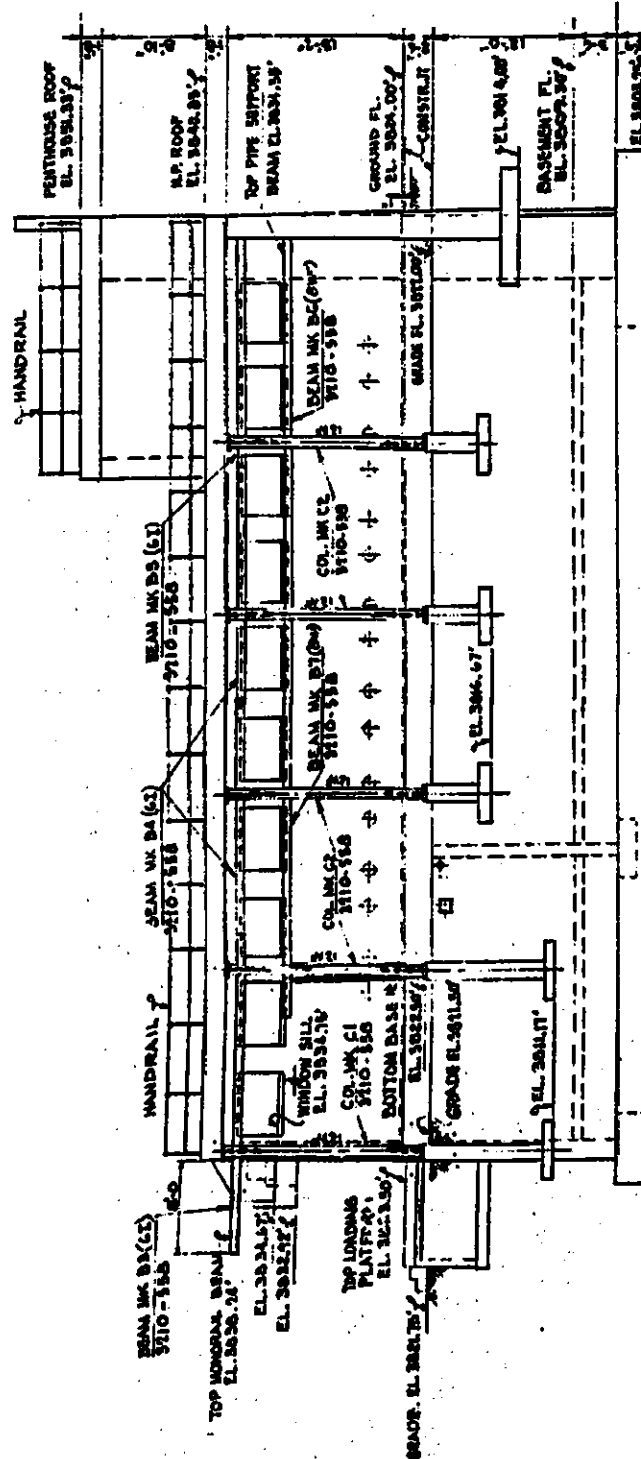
Test Cell C, Building 3210, east elevation, ca. 1960.
